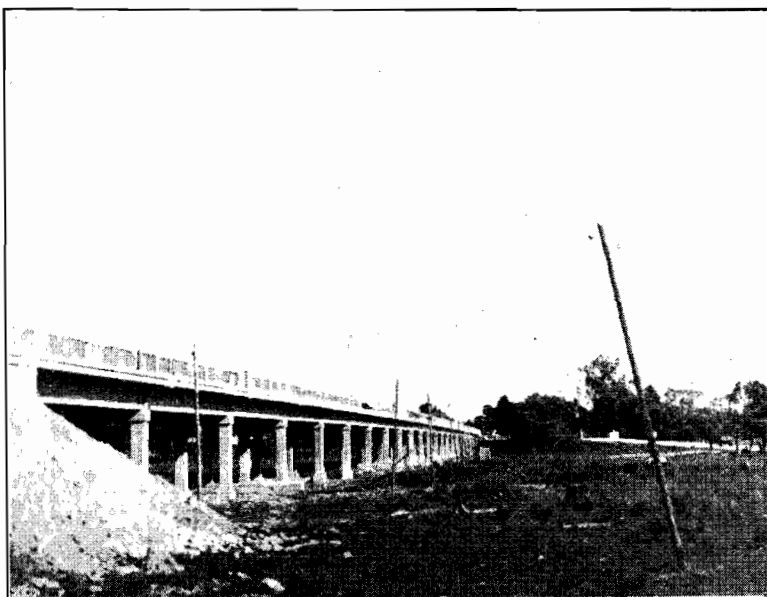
Showing reinforced concrete bridge 1,100 feet long over river flats near Rosedale.
